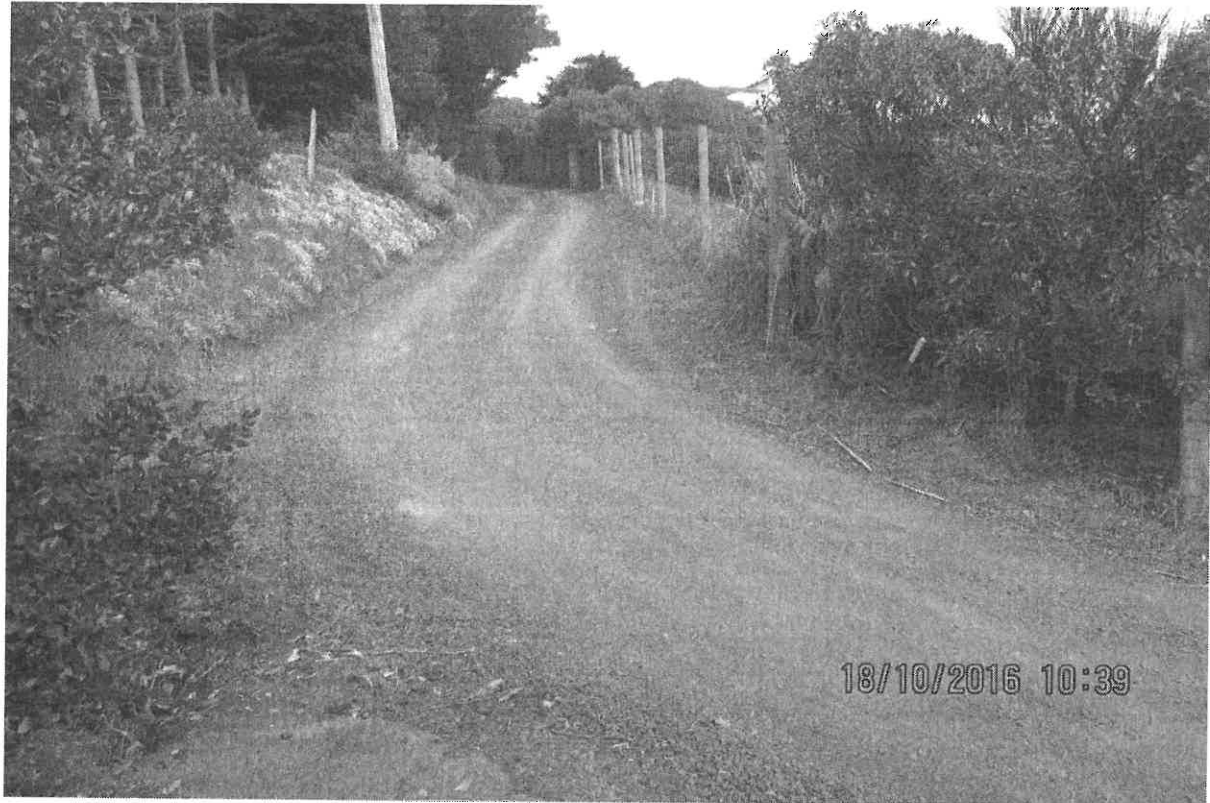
The view looking up the shared access from the driveway entrance of proposed Lot 2.
